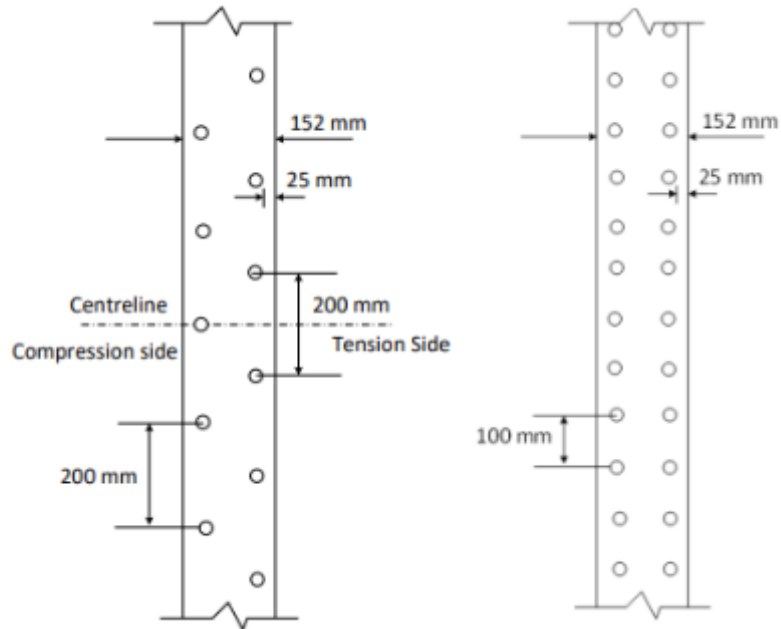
Mullion hardening using steel plates with bolted screw pattern (Chavan, 2021)
